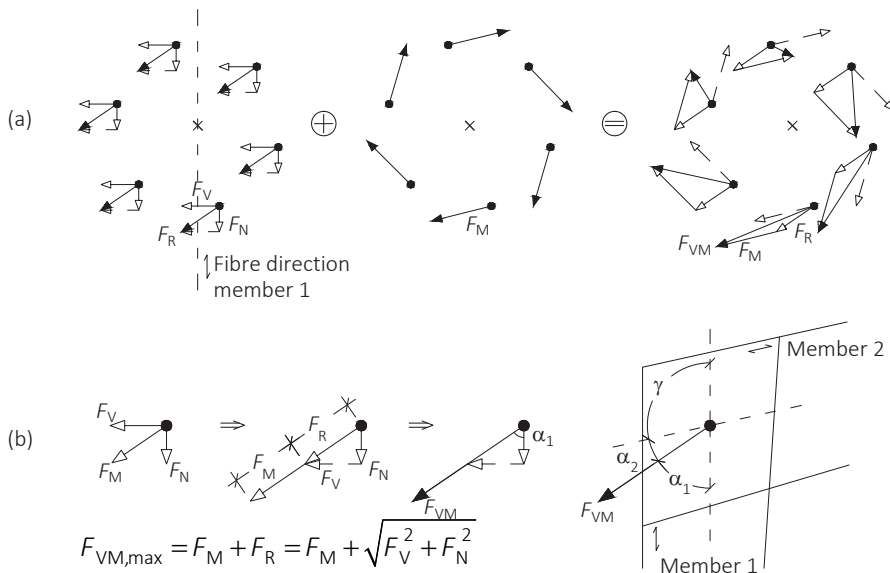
Loads on fasteners in a circular fastener arrangement with respect to member 1 = column.
